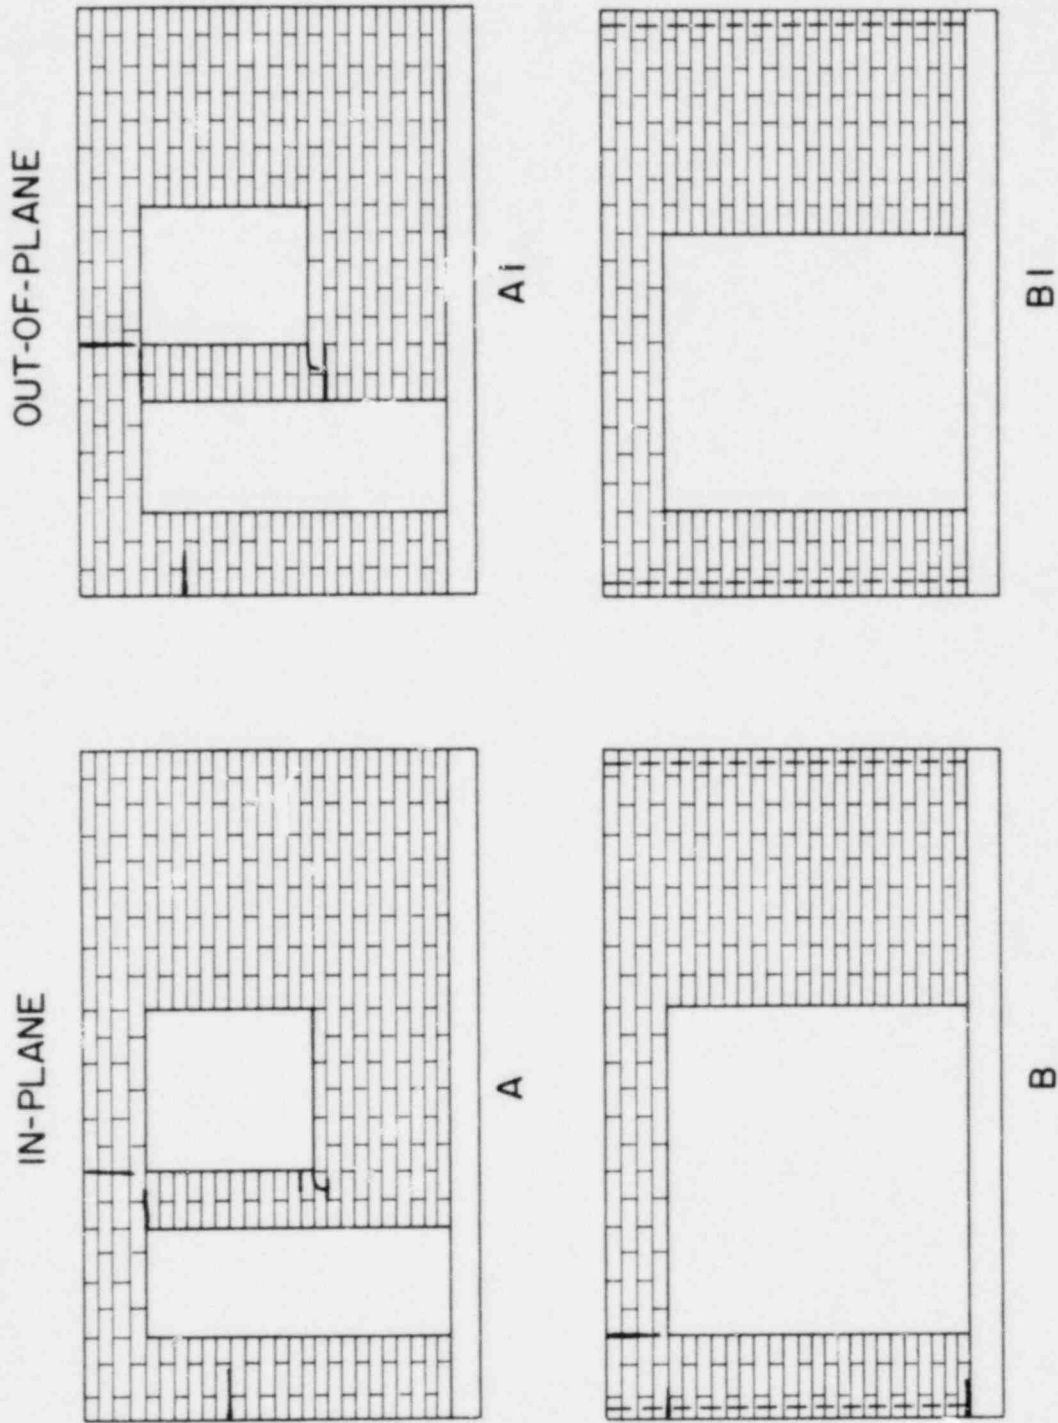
(a) DISTRIBUTION OF CRACKS IN THE MASONRY COMPONENTS: HOUSE 2, BEFORE TESTING
